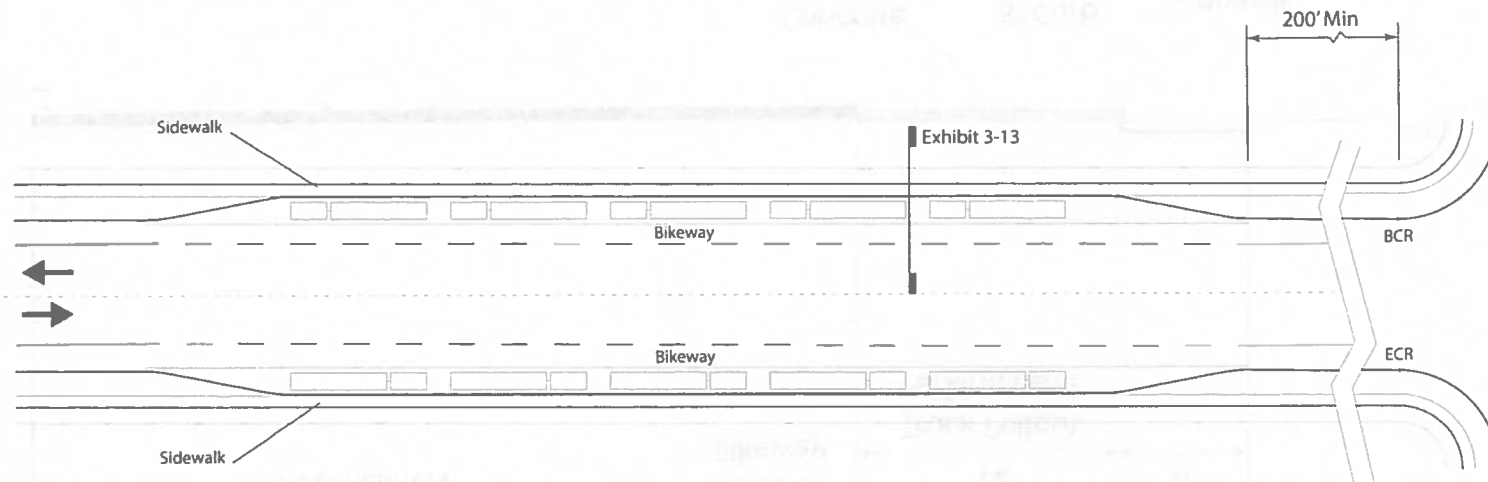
Truck Parking Lane Section (pg.3-10)
